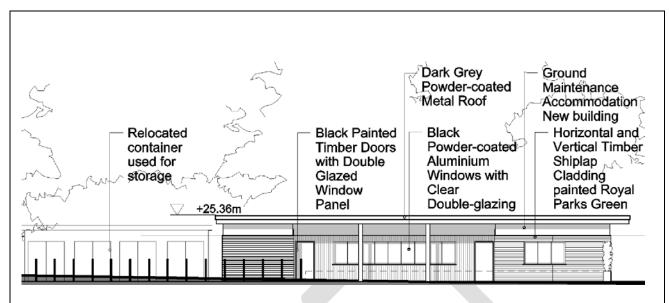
Proposed East (front) Elevation from yard, including containers to the left.
